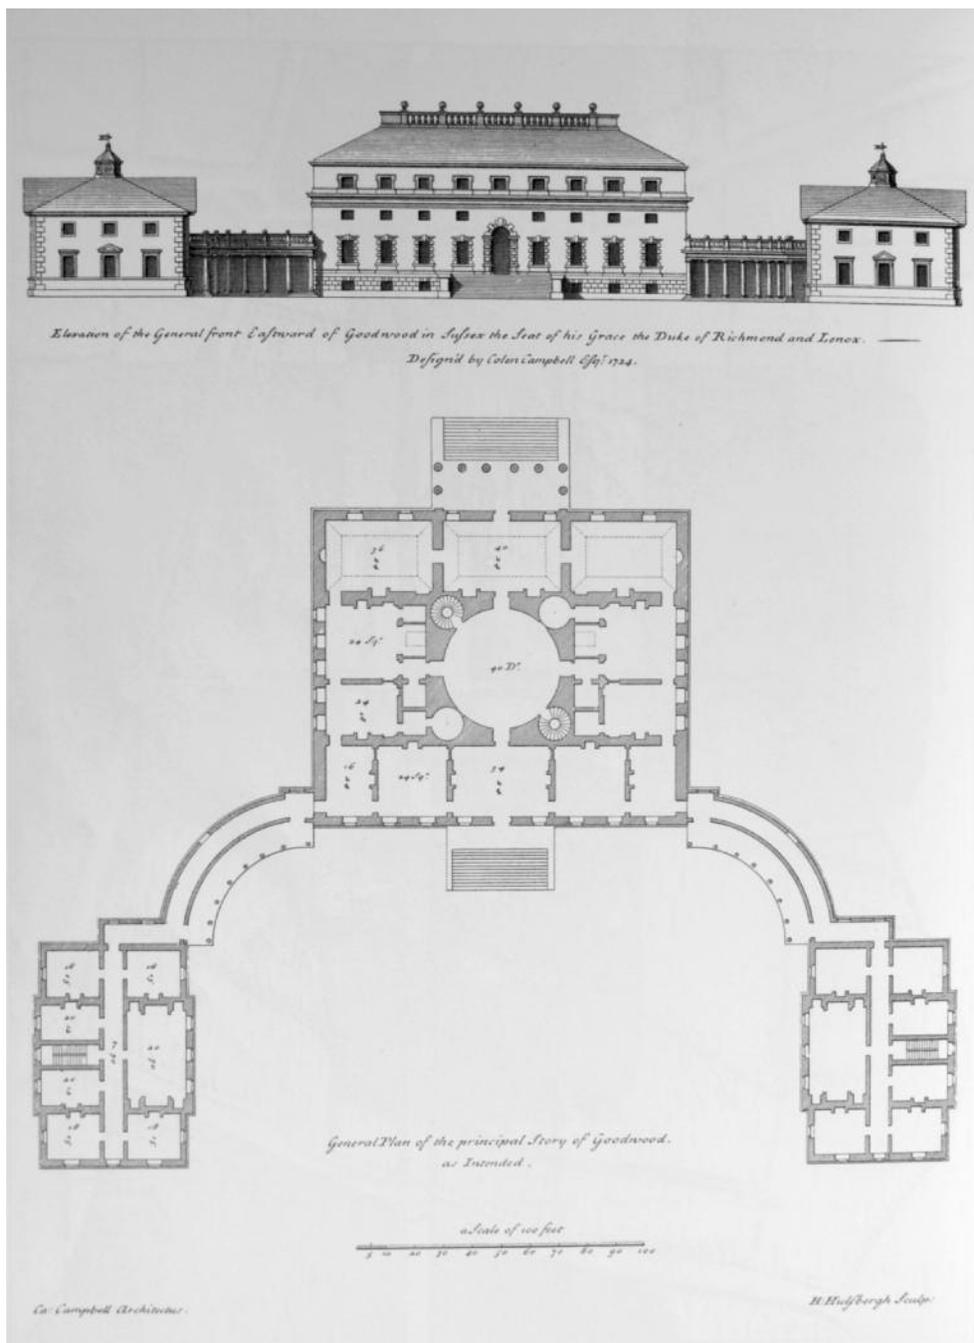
Colen Campbell: Plan and Elevation of Design for Goodwood, Sussex,
